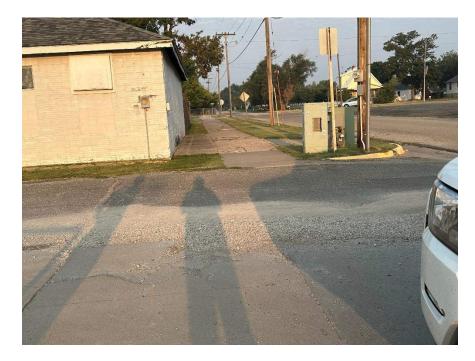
Alley between Preschool/Daycare and Elementary School (north entrance)
